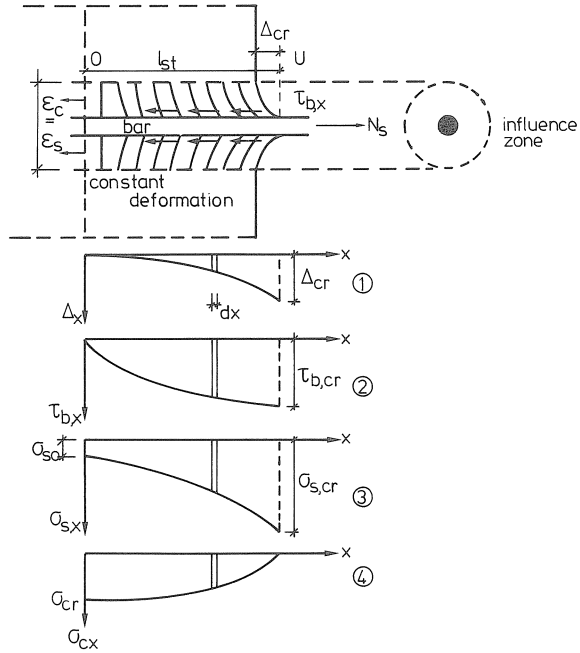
Stresses in steel and concrete over one half of the transfer zone.
